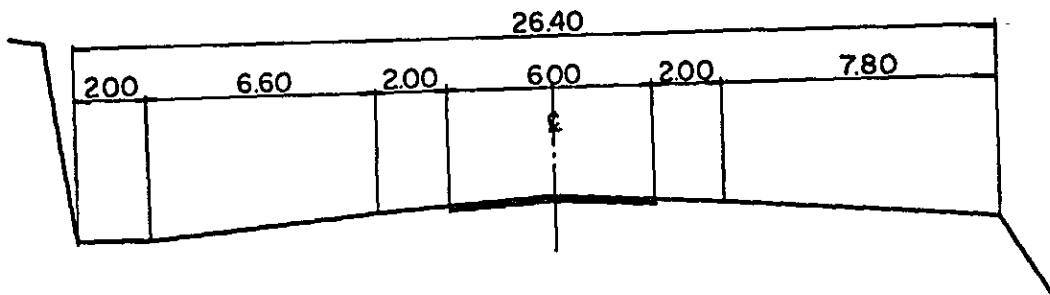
Typical Cross Section of Existing Road (Cont'd)
